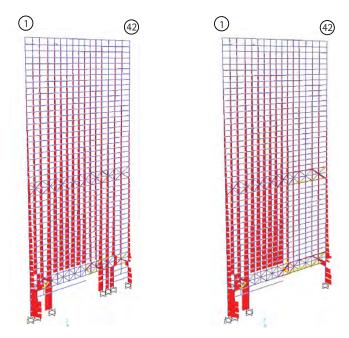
Redistribution of North exterior frame axial loads in Stage 4 due to buckling of Columns 44, 45 and 46
